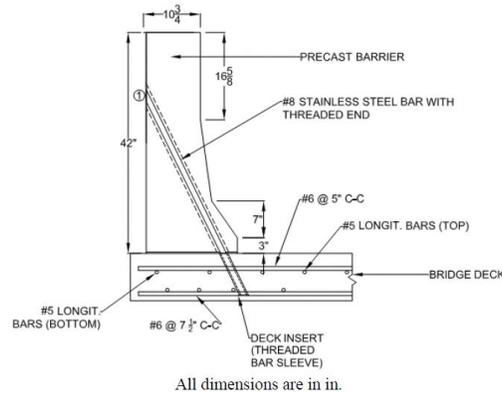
44 Inclined bar connection between precast barrier and deck [68].
